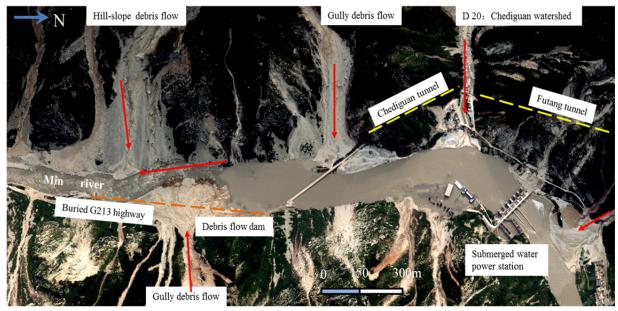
Destructions of highways, bridges, tunnels and hydro power stations
